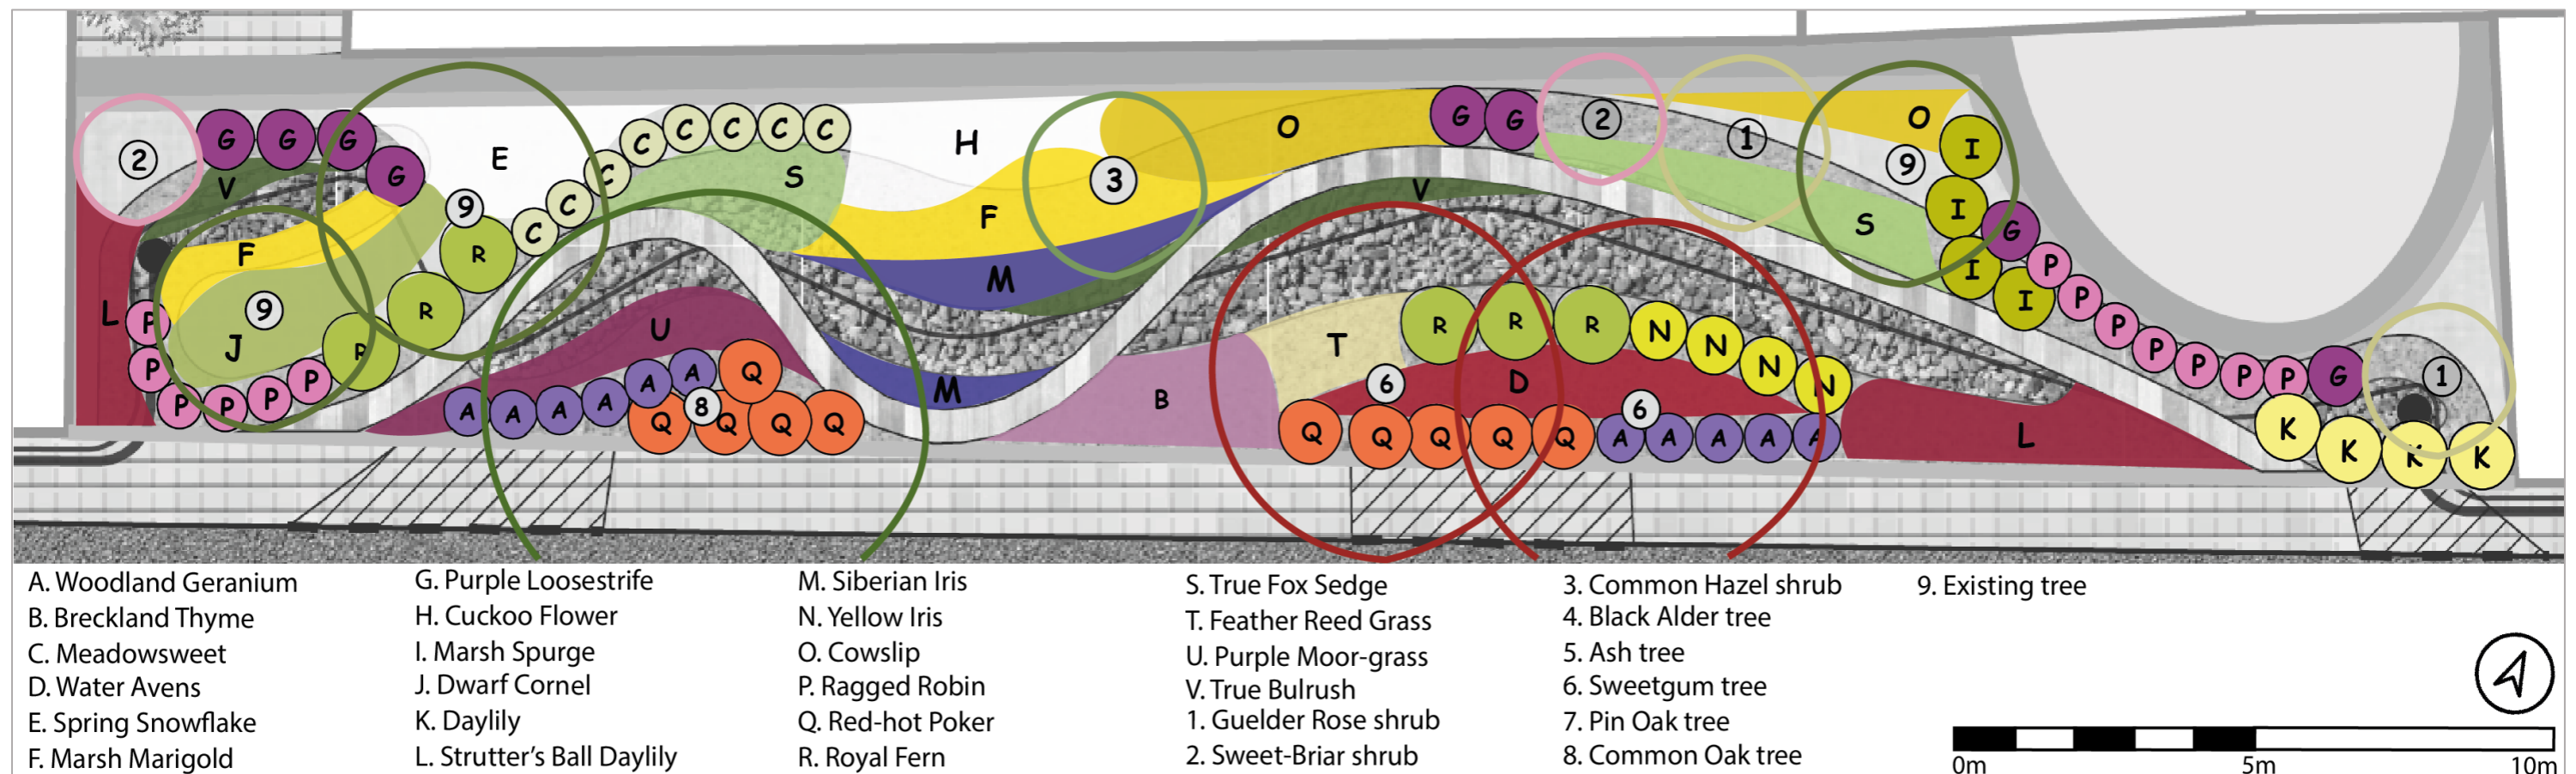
Planting plan of rain garden De Vestingstoren (figure made by author)
